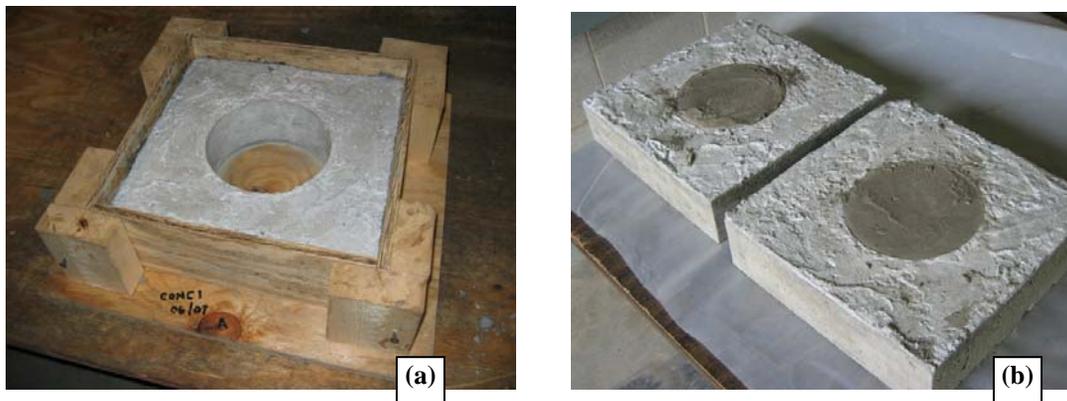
Shear Pocket Specimen Before (a) and After (b) Filling with Grout
